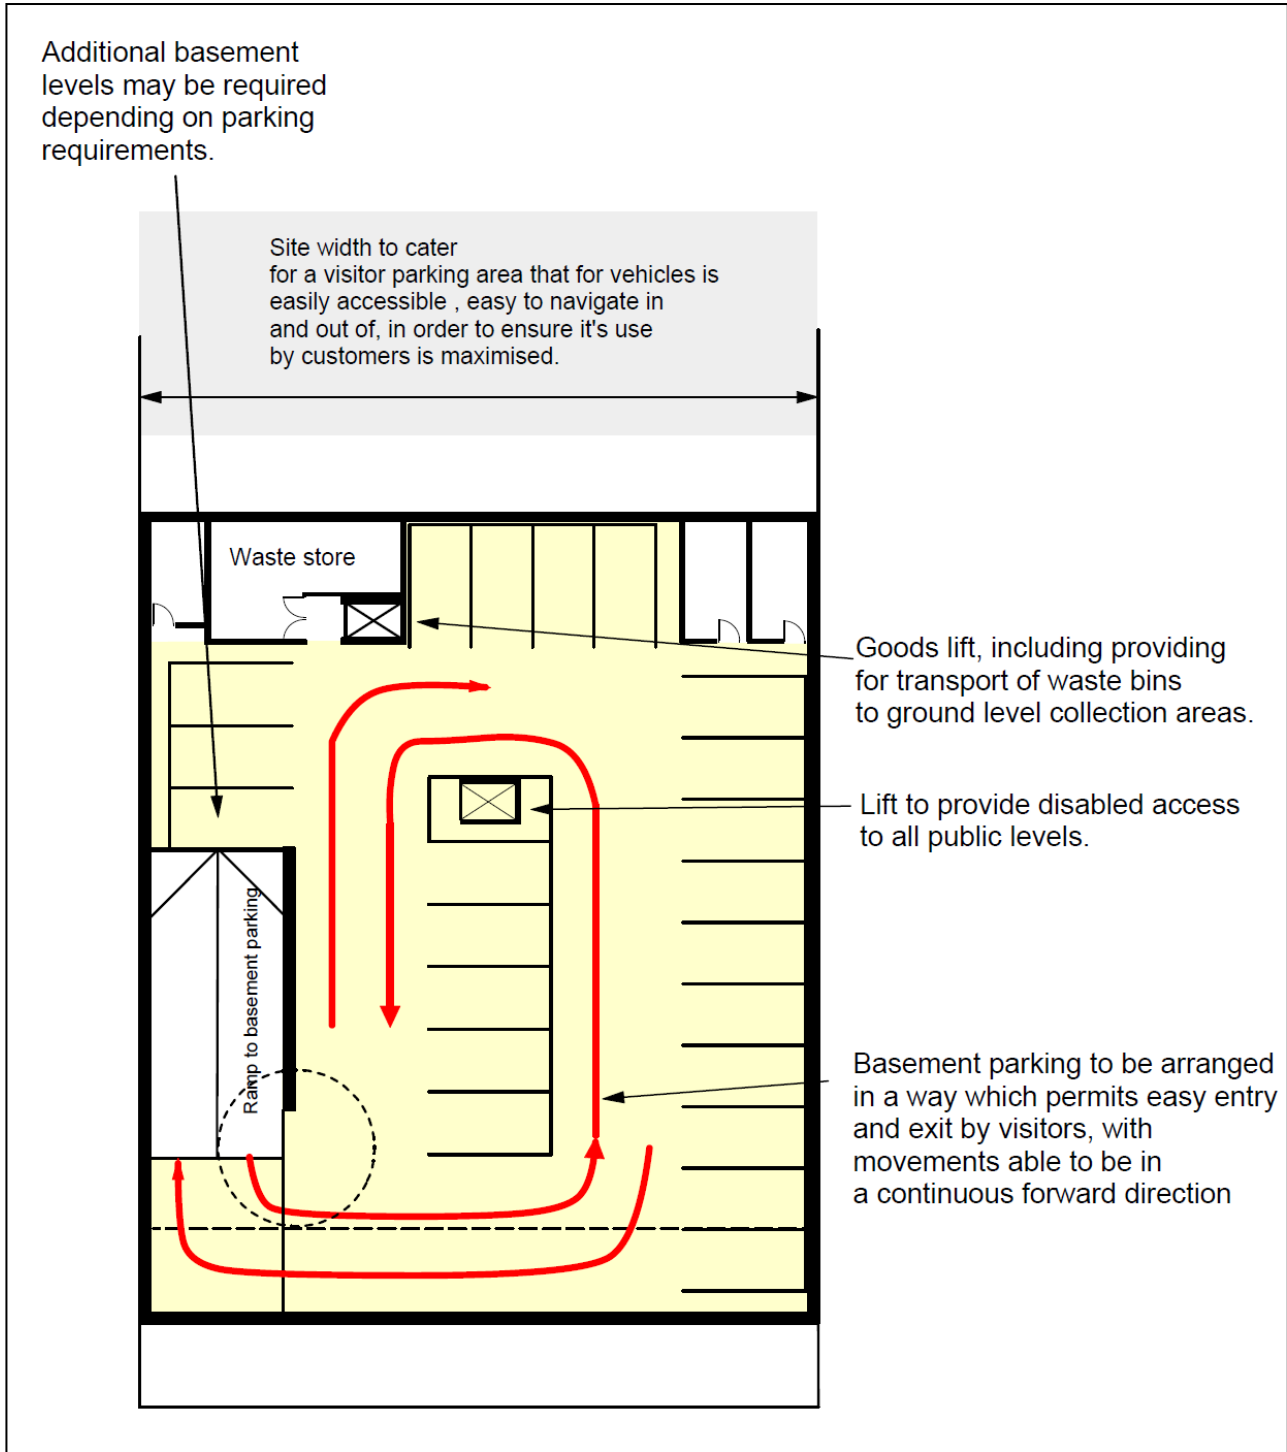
Site Access and Parking Location Principles diagram for consideration of site width and commercial development showing basement floor plan.
